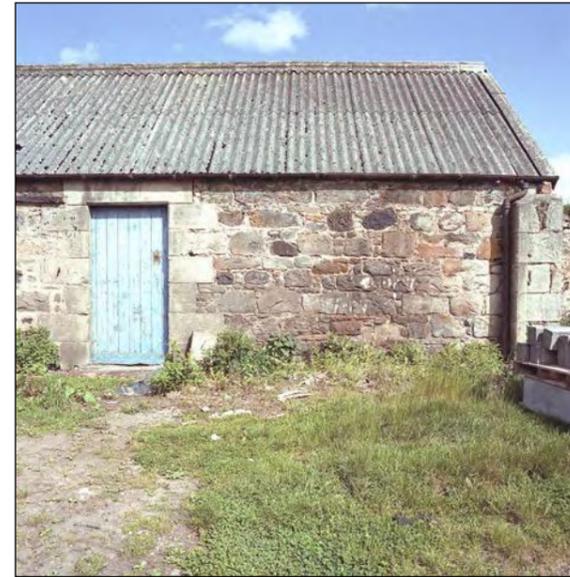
Range D, South elevation east end. The remains of an entranceway to the demolished East Range is visible at right of picture.
